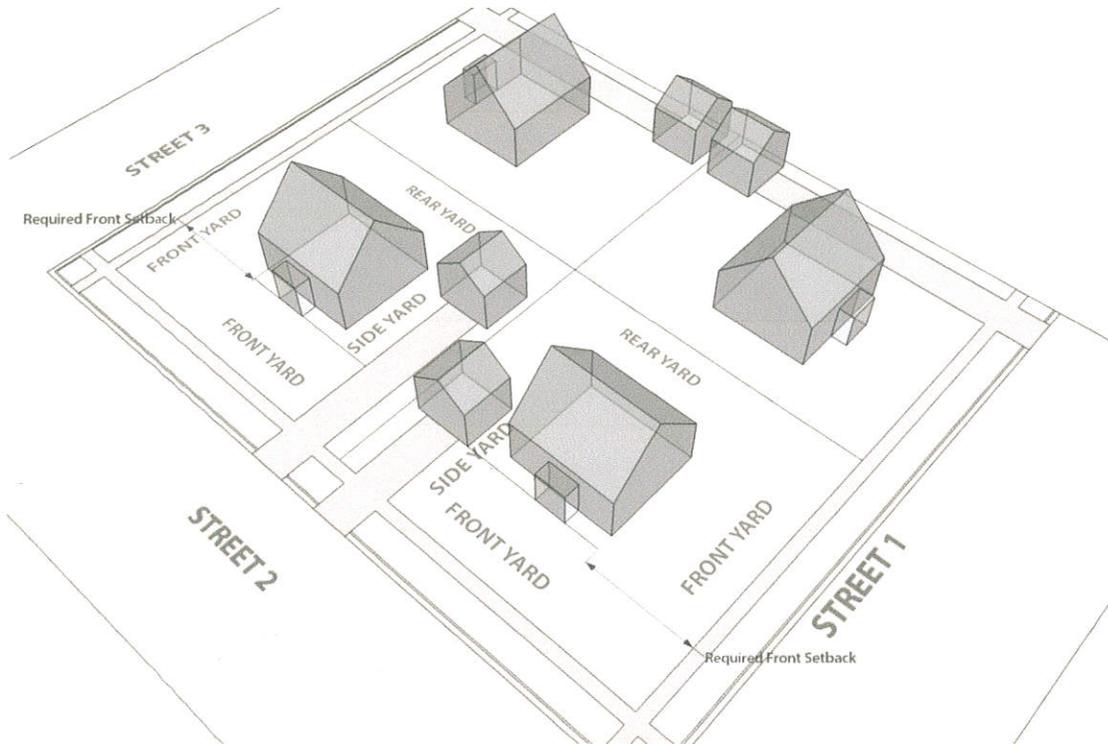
Accessory Building Location for Corner Lots with Side-Side Front-Front Yard Situation
